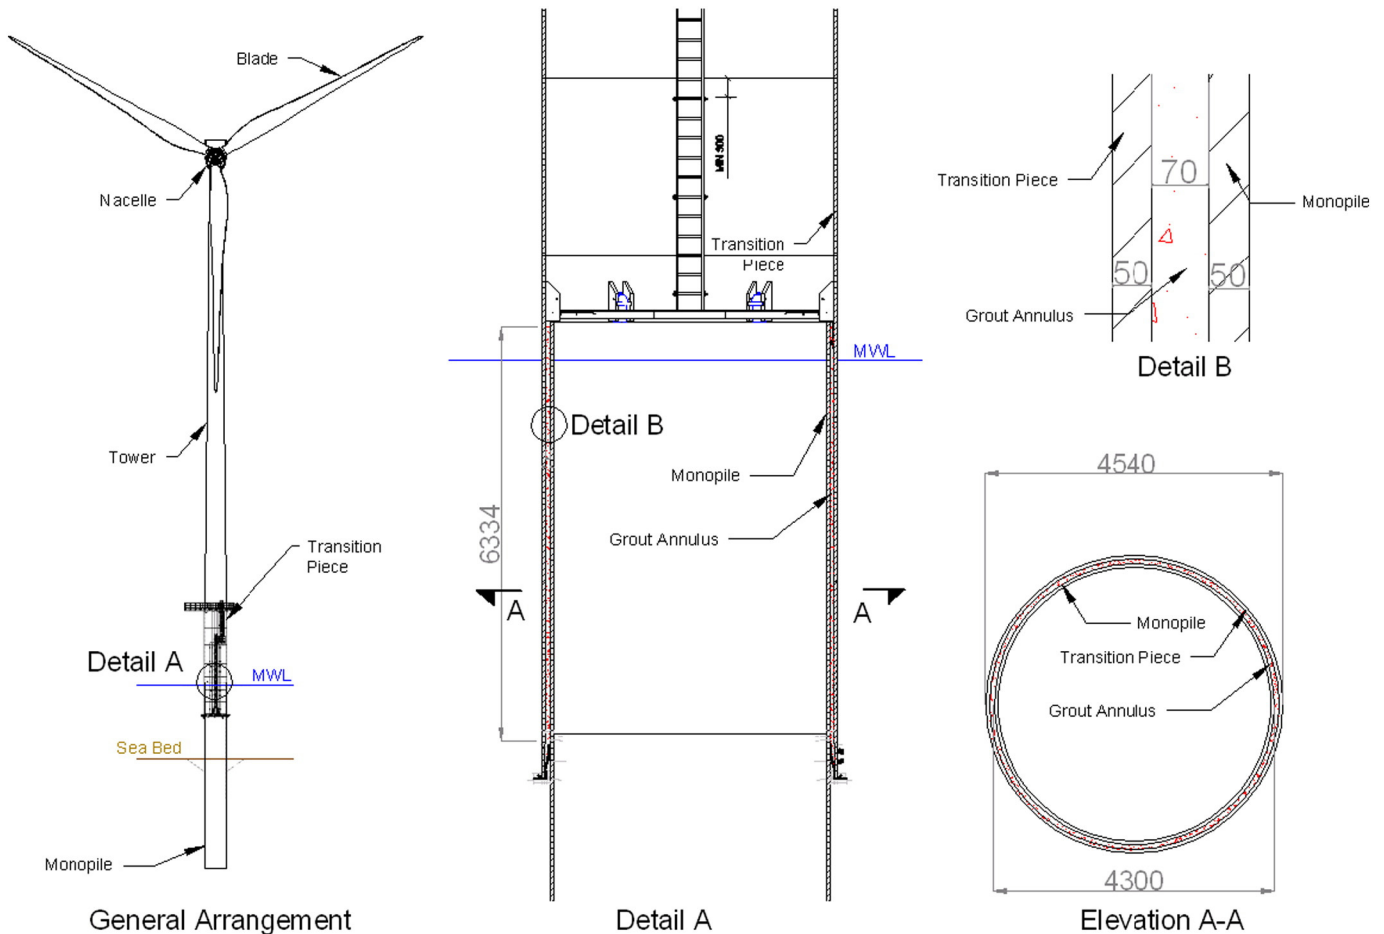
Typical general arrangement of a plain-pipe grouted connection for an offshore WTG foundation.
